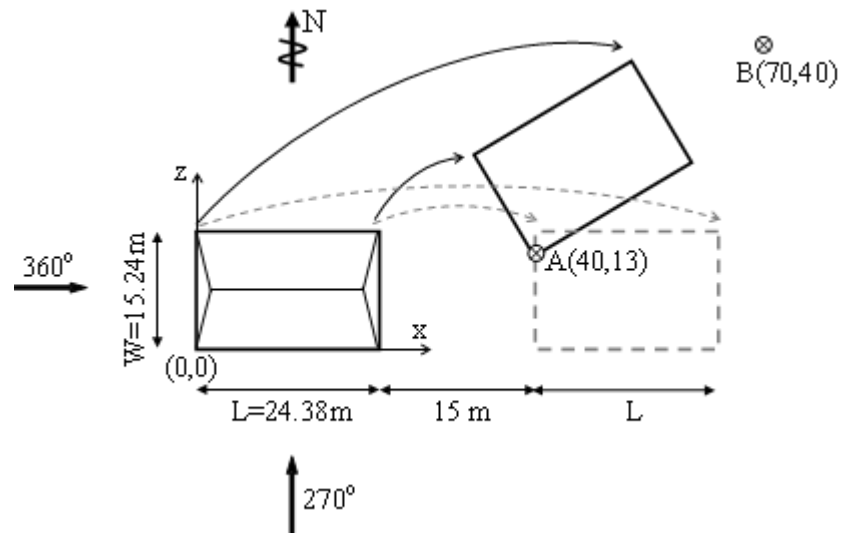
Schematic sketch of the plan view of the global roof failure
